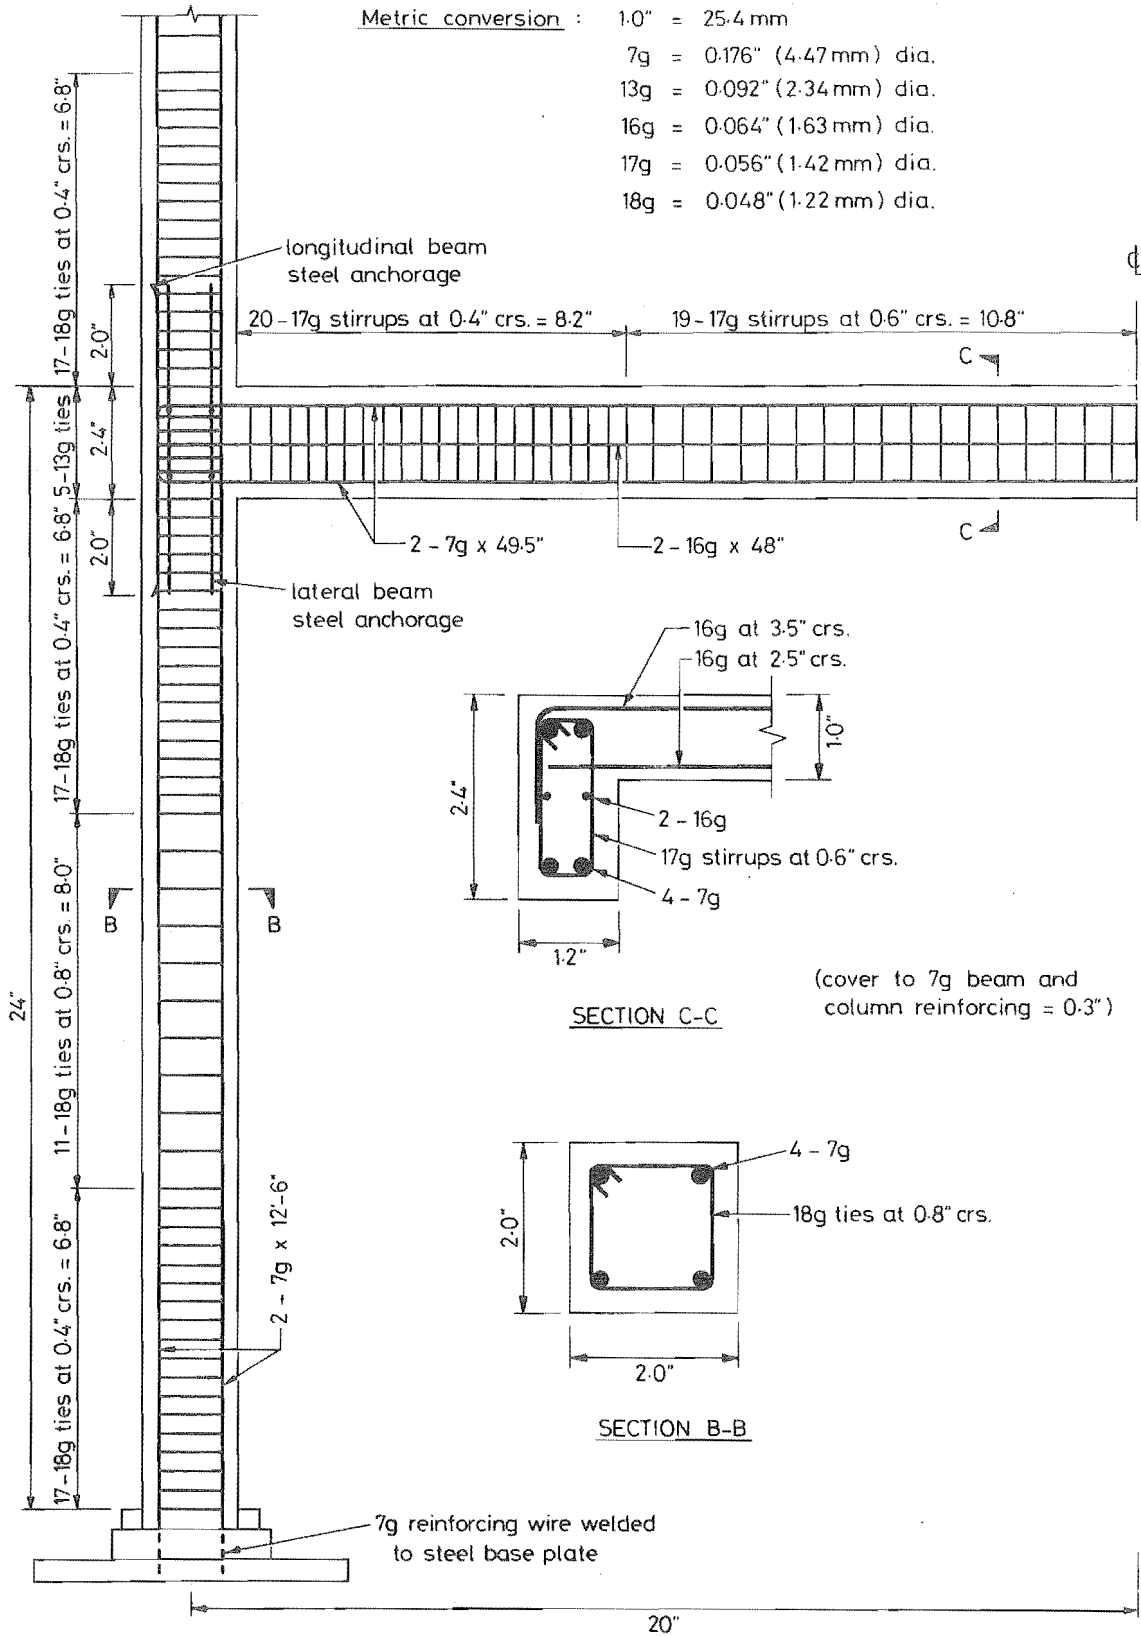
LONGITUDINAL FRAME REINFORCING DETAILS
